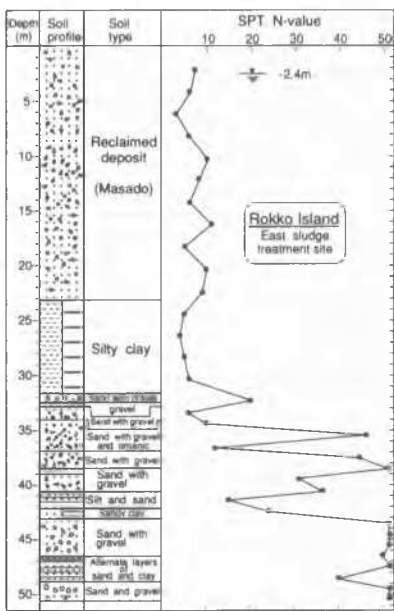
Soil profile at a site near the section R-2 and R-3 (Hanshin Highway Authority, 1993)
